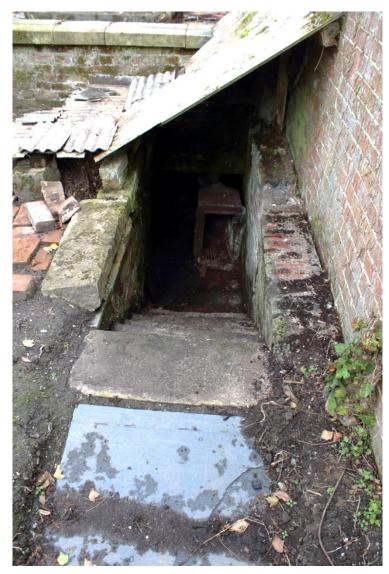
Photo showing the corrugated asbestos roof and steps down to the boiler house of Glasshouse 1. The small cast iron boiler can be seen at the bottom of the steps. Looking north.
